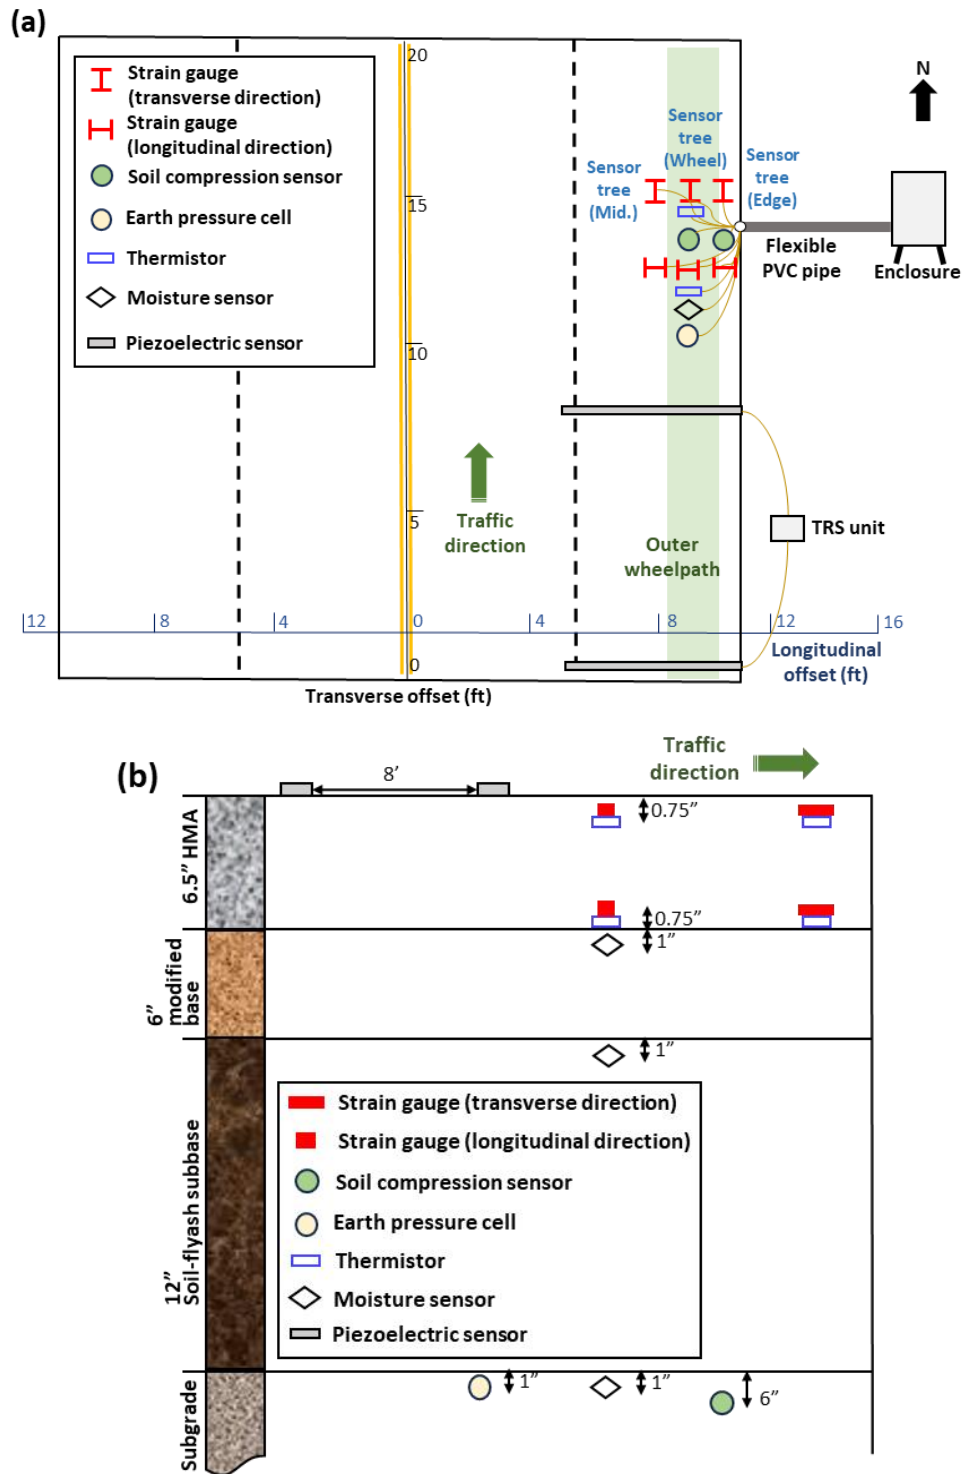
Sensor installation plan for full-depth flexible pavement section: (a) plane view and (b) cross-sectional view
